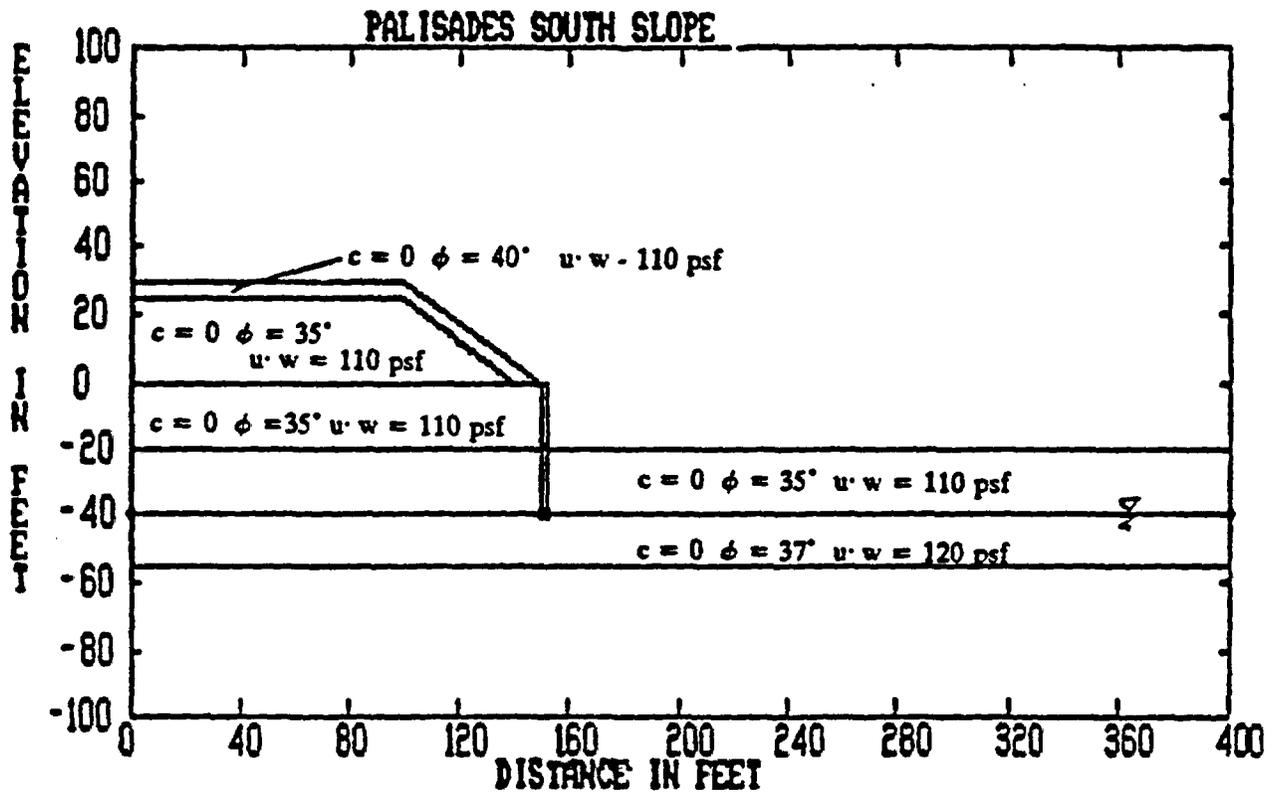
CROSS SECTION OF THE SOUTH SLOPE
